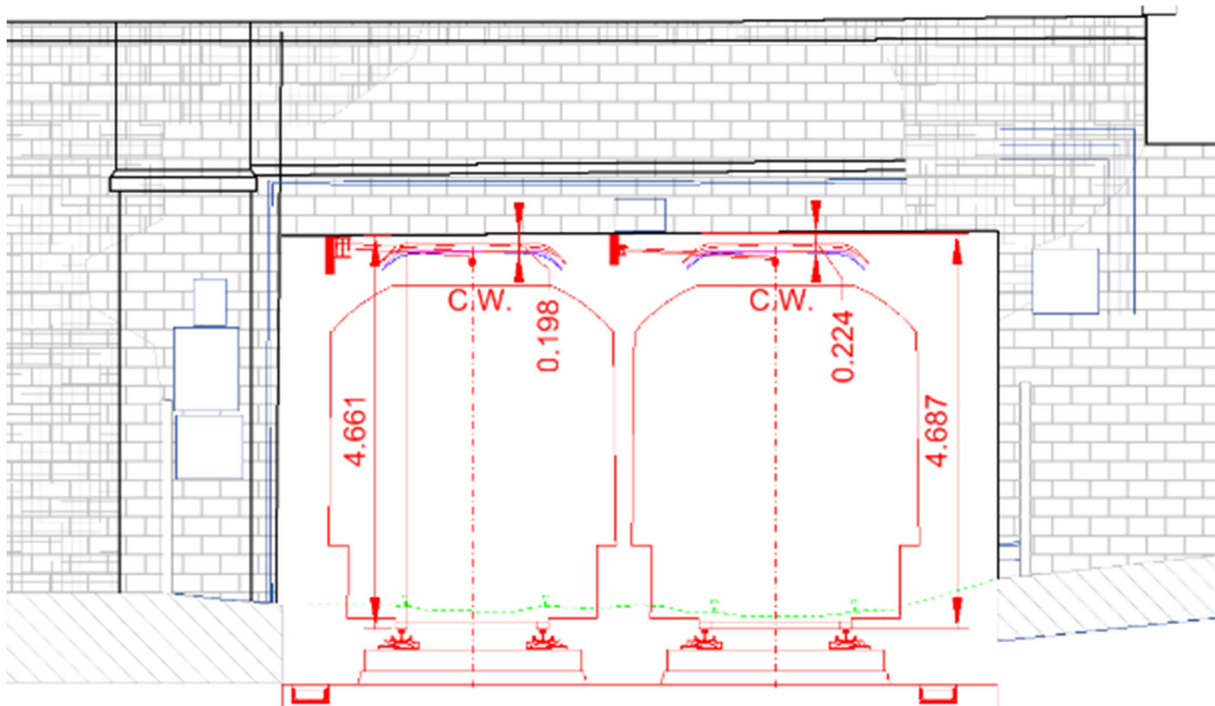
Example cross section for fitted OHLE system in twin area - Facing North
